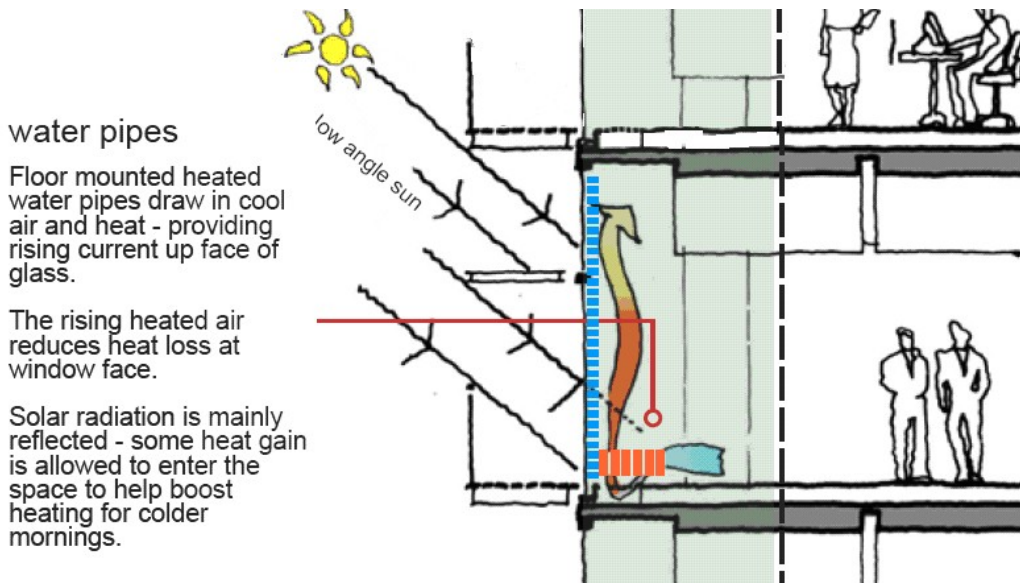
Winter mode in CH2 building at the north and south facades³¹
